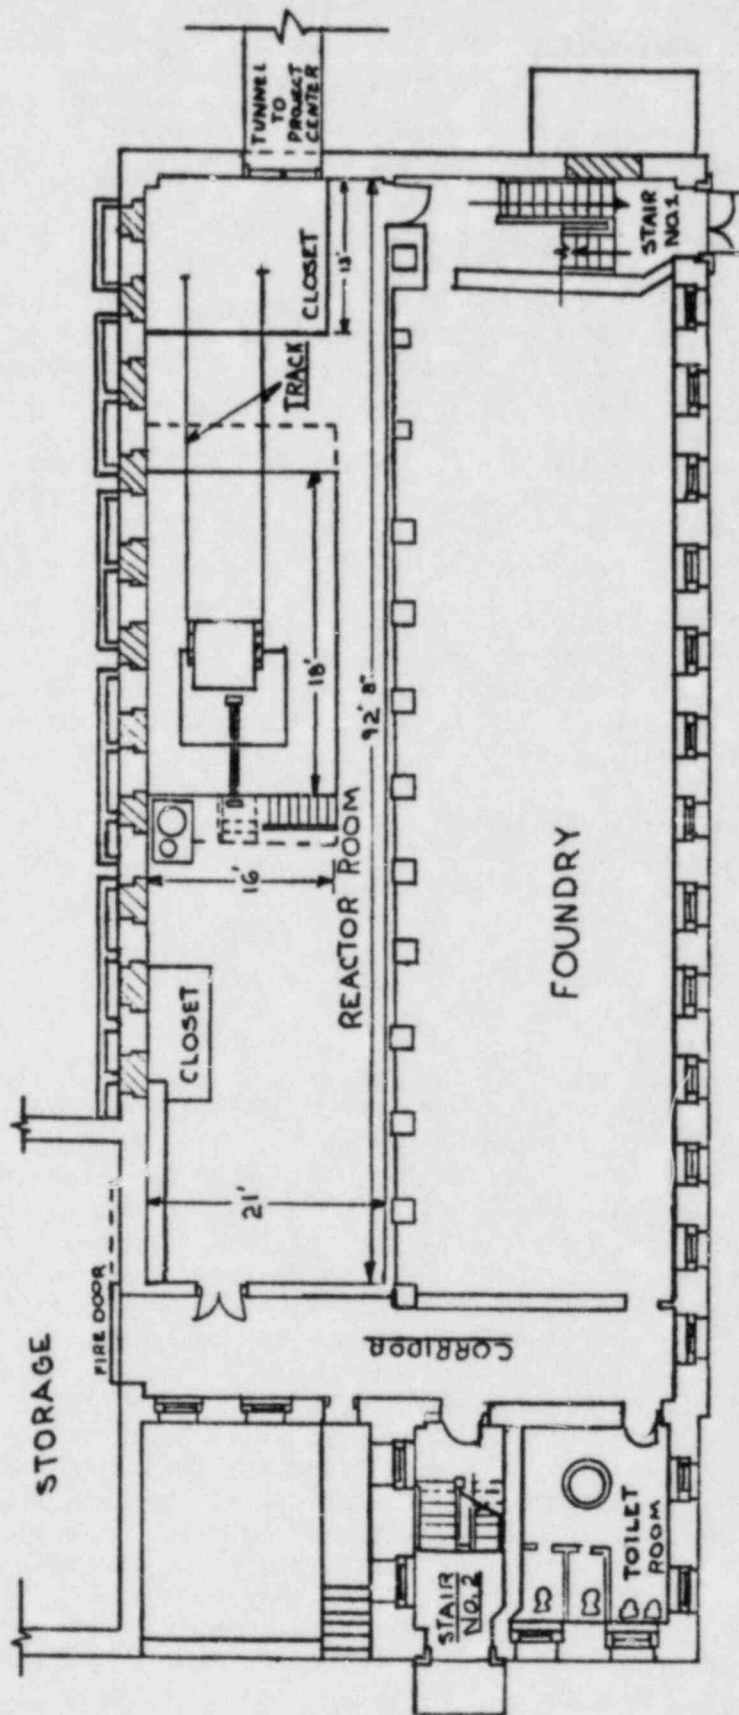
Basement floor plan (ceiling height 10 ft 6 in.)
